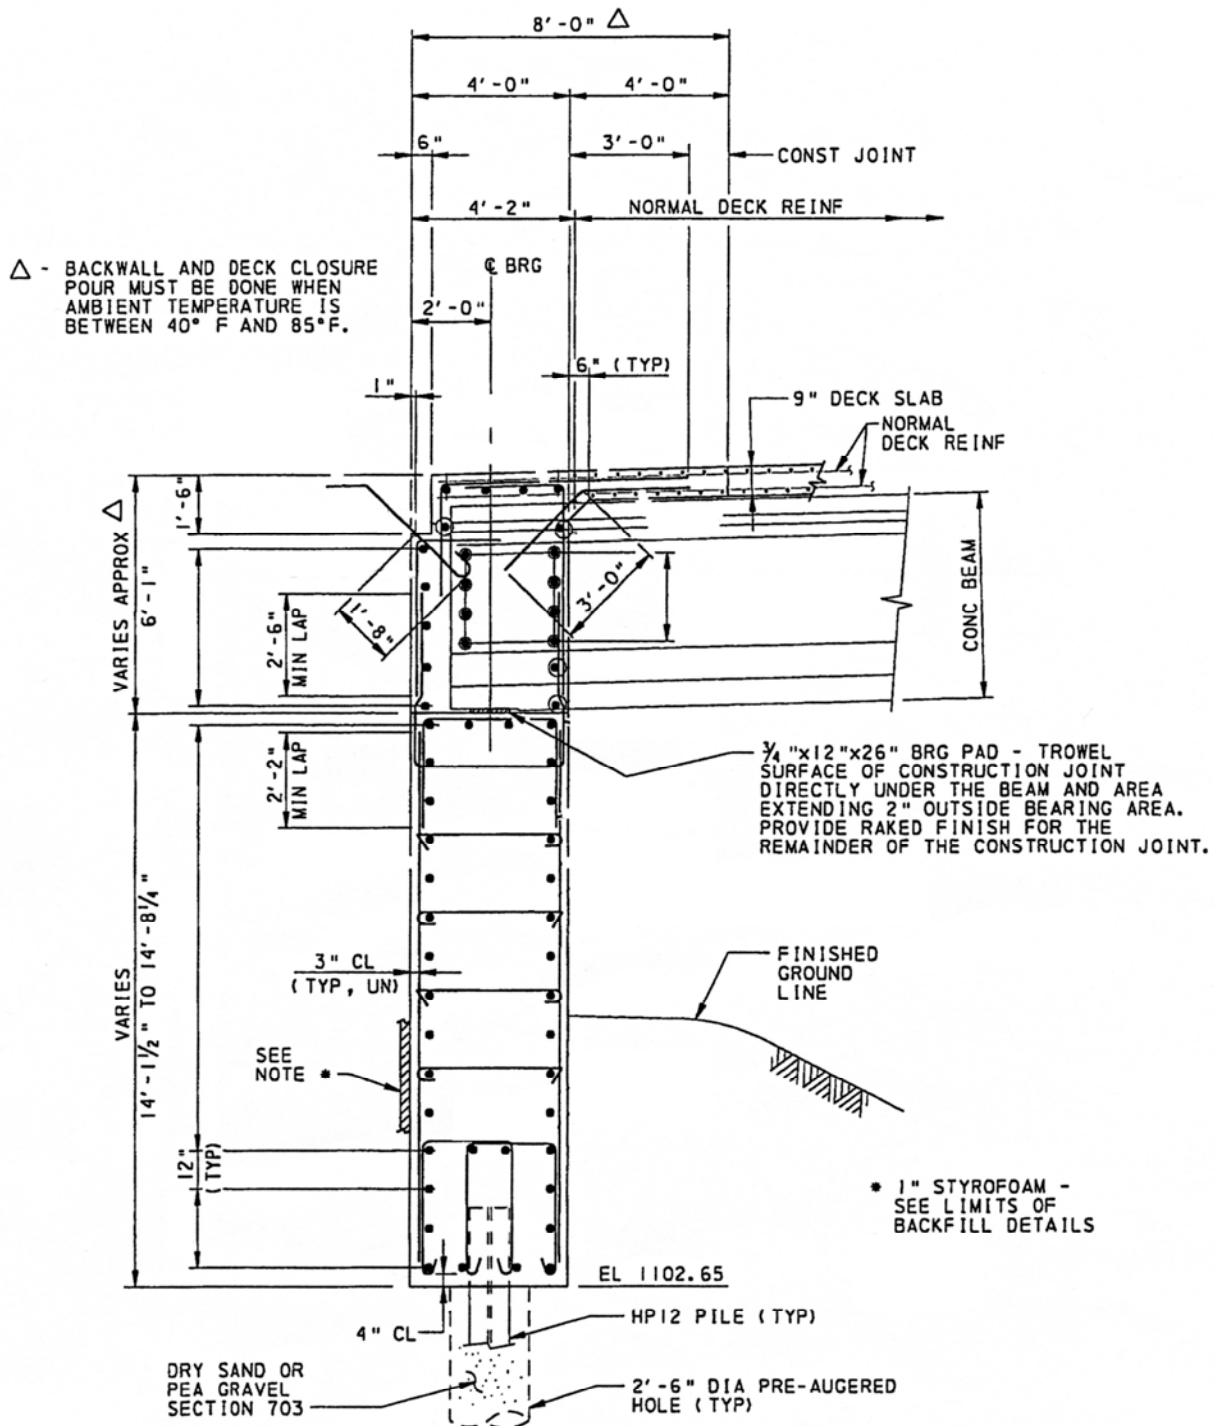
Cross-Section of Bridge 203 Abutment 2.
